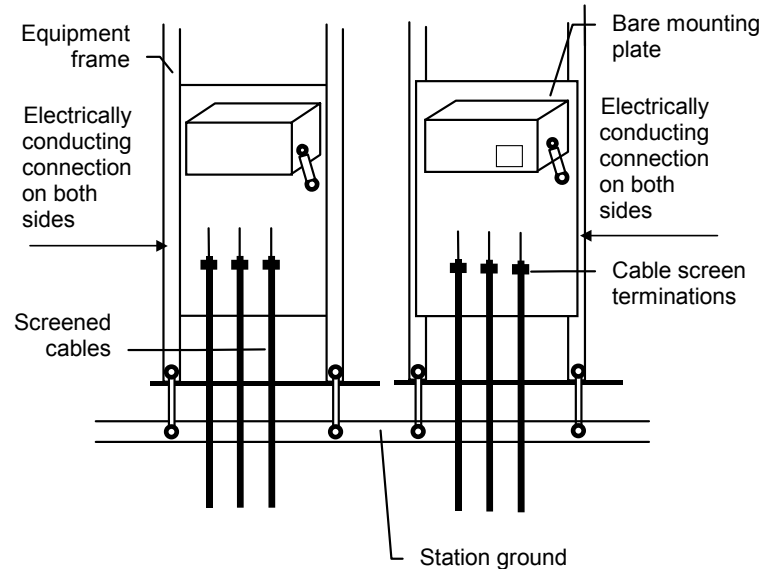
Cable screen terminations in open equipment frames (rear view for semi-flush mounting, front view for surface mounting)
